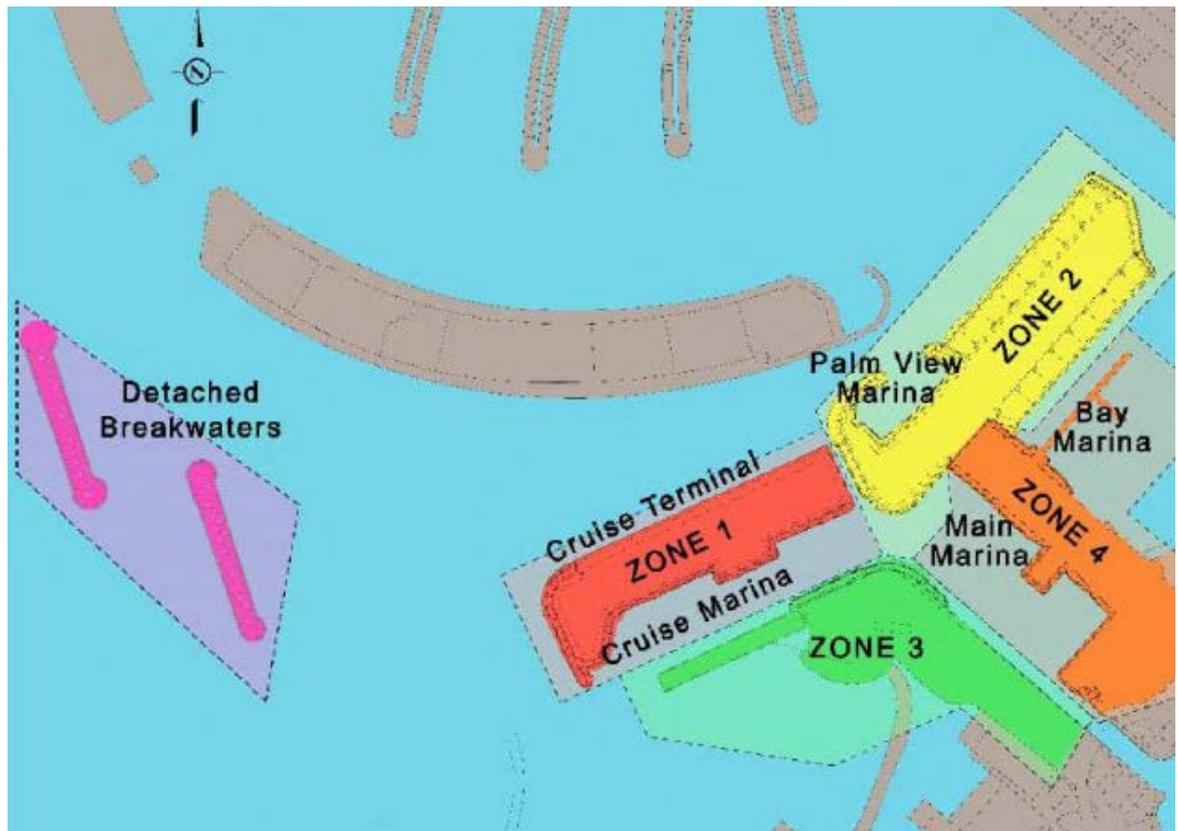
Proposed Dubai Harbour Zoning Plan
